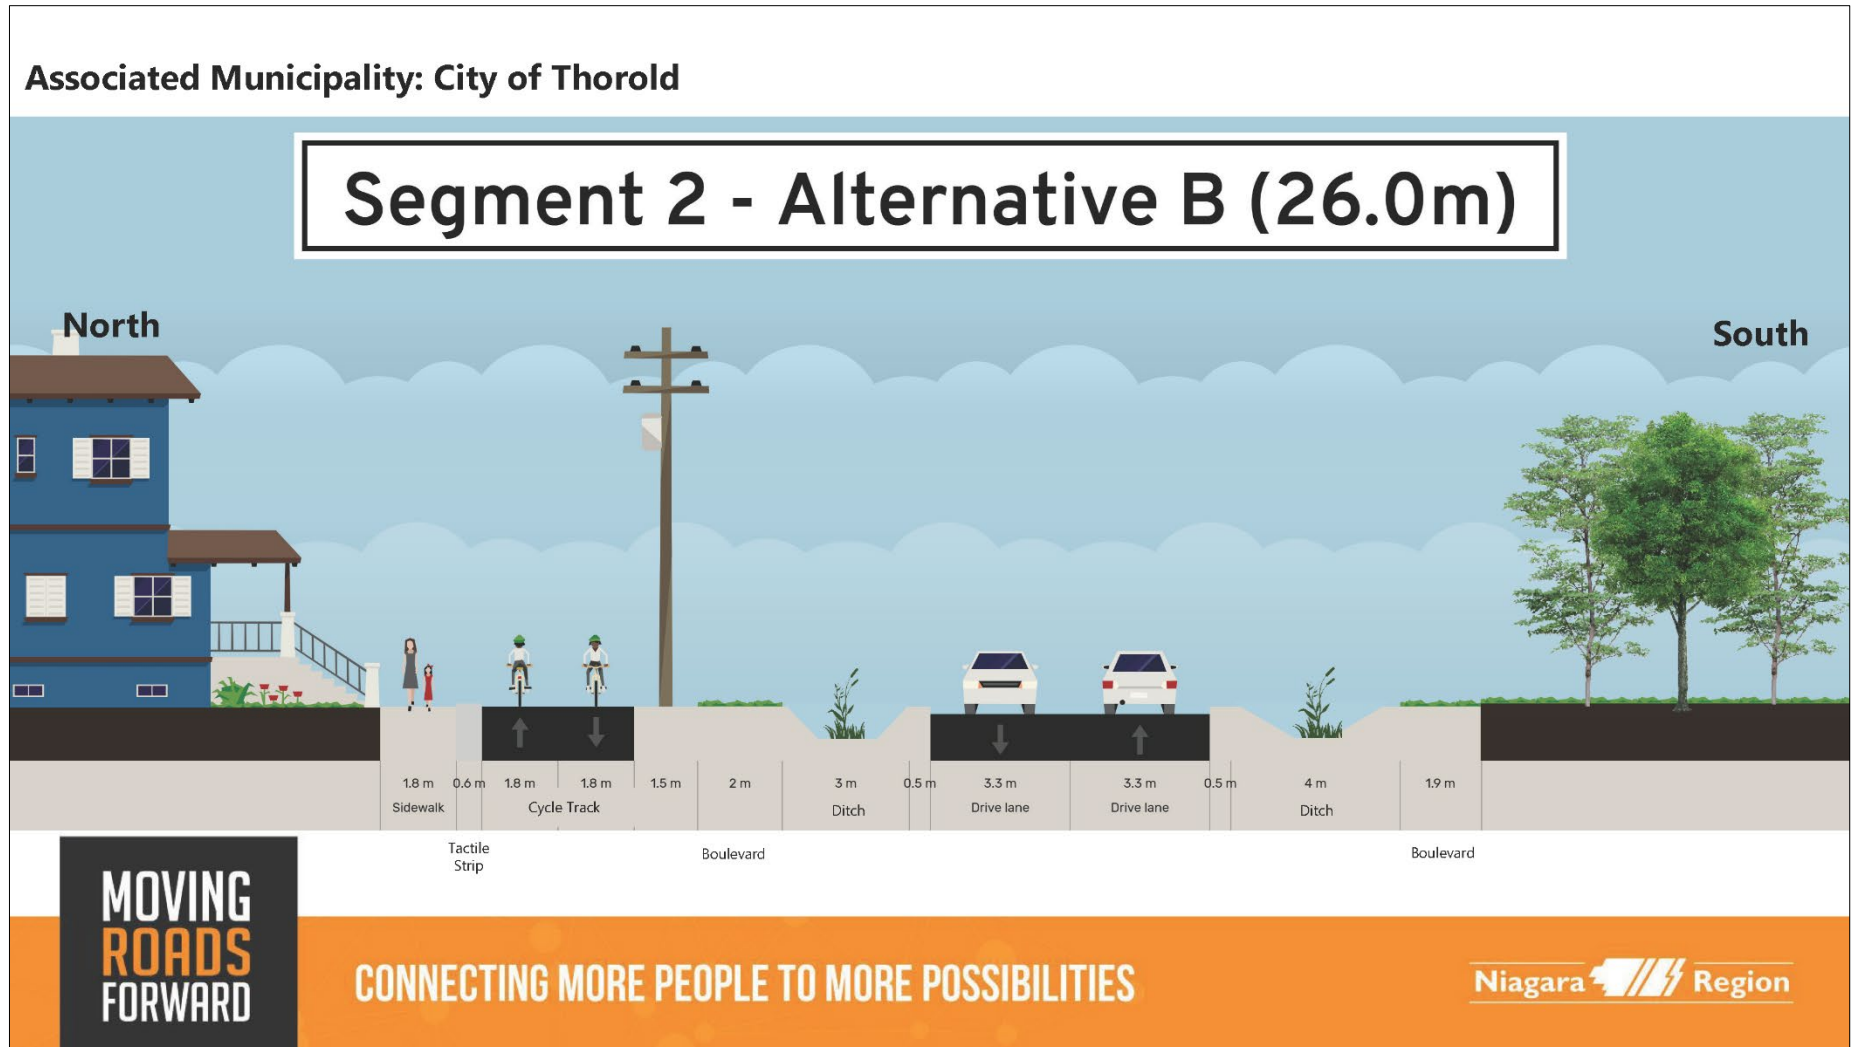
Segment 2 – Road Cross-Section Alternative B
